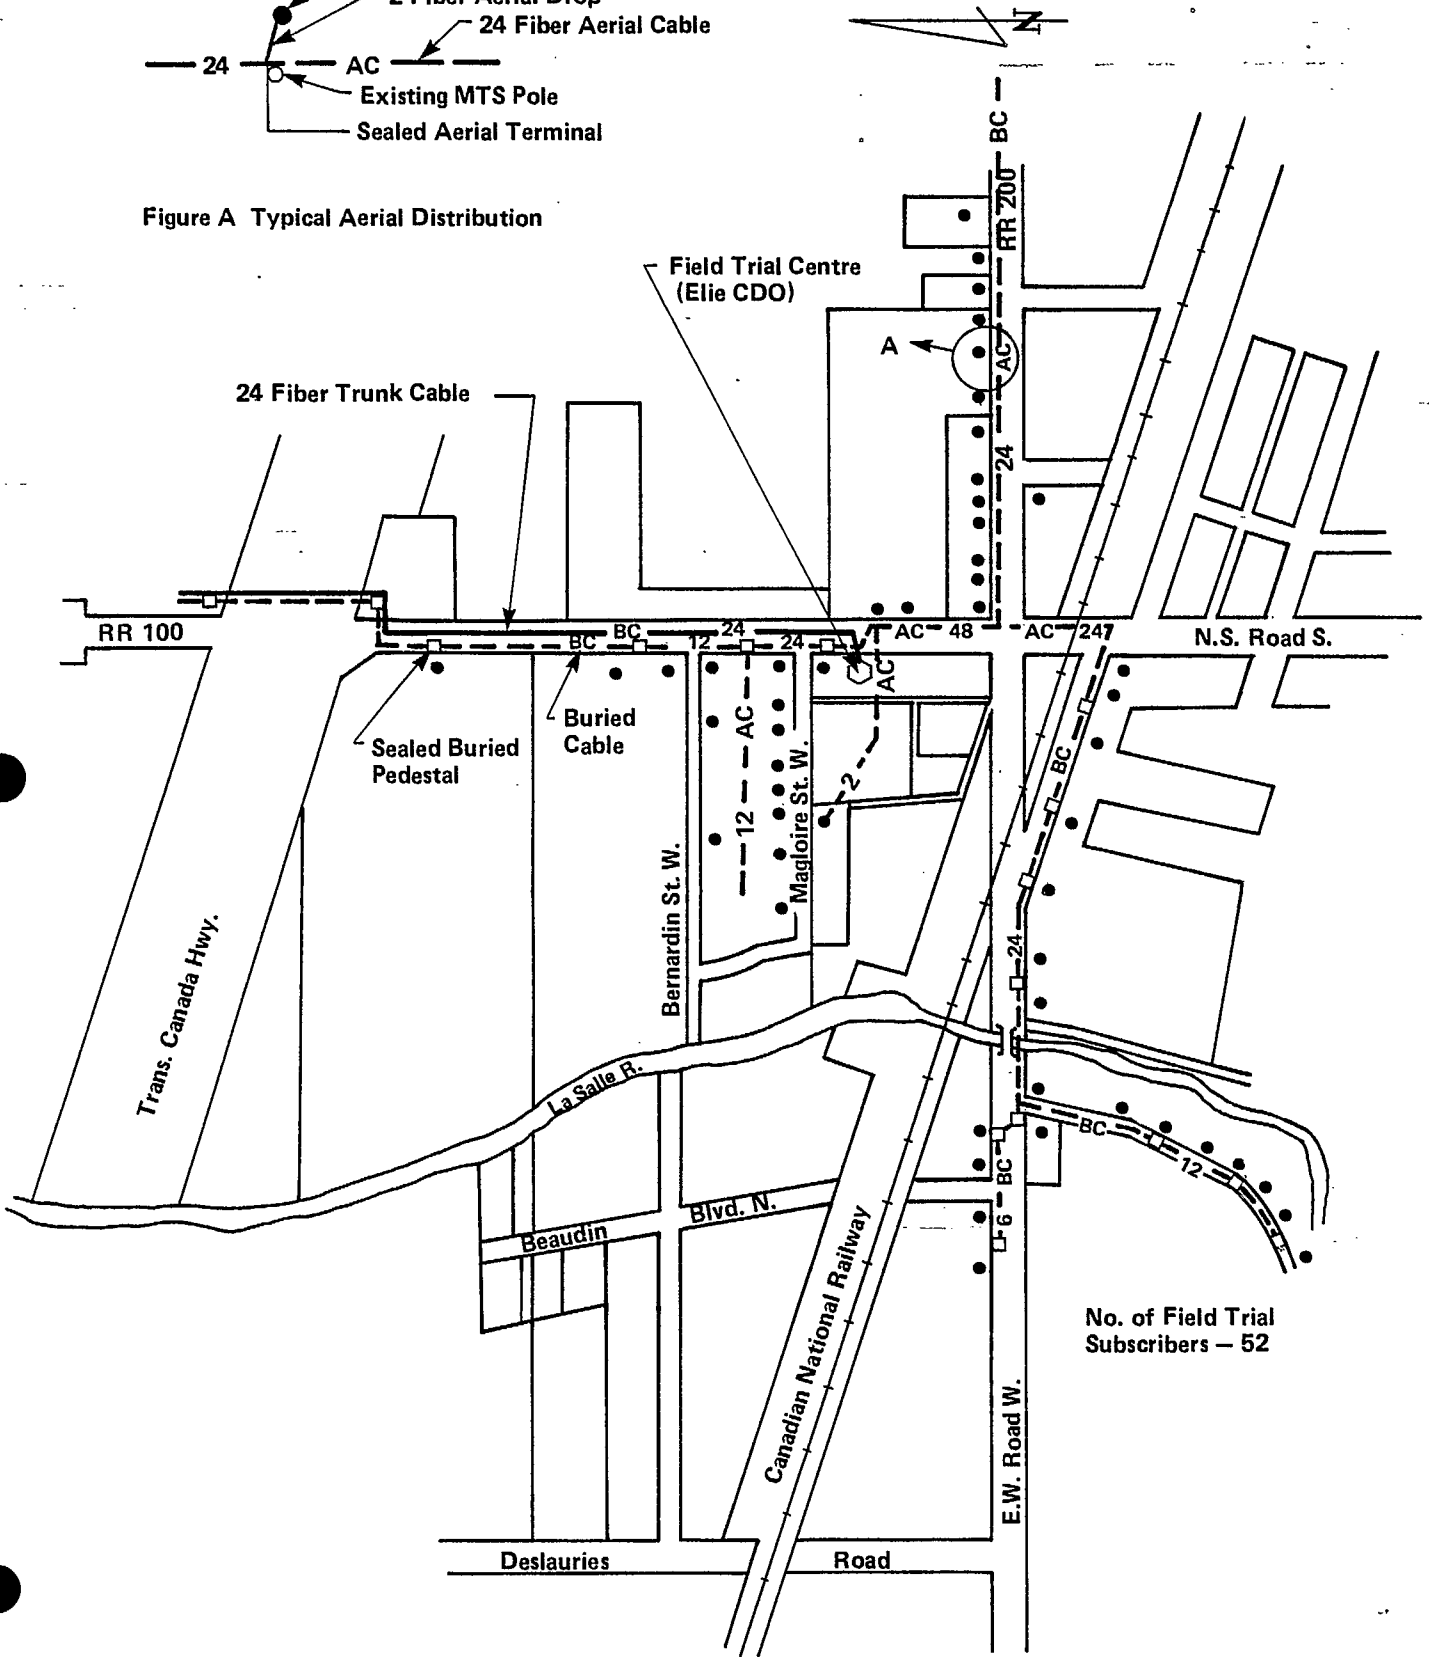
Phase 2 Outside Plant Route Details - Town of Elie
